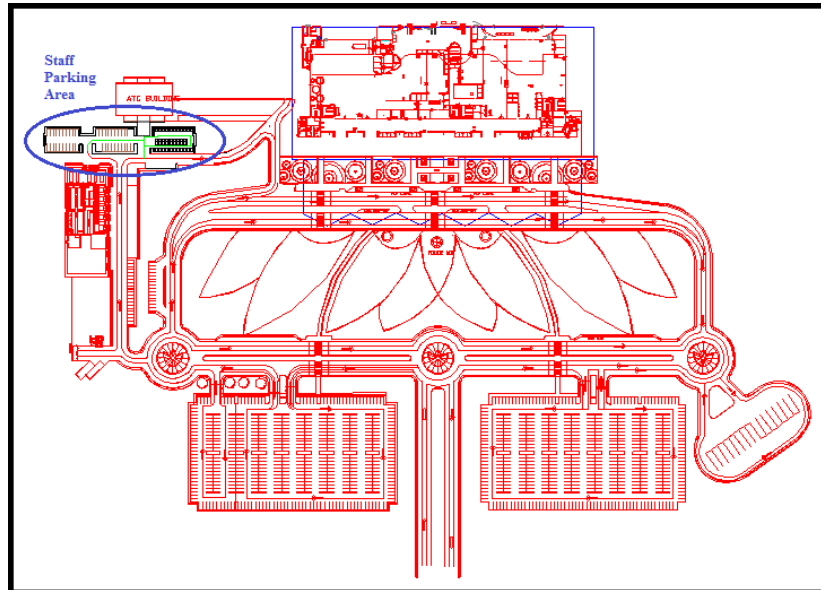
Typical Plan Layout of Staff Vehicle Parking Area
